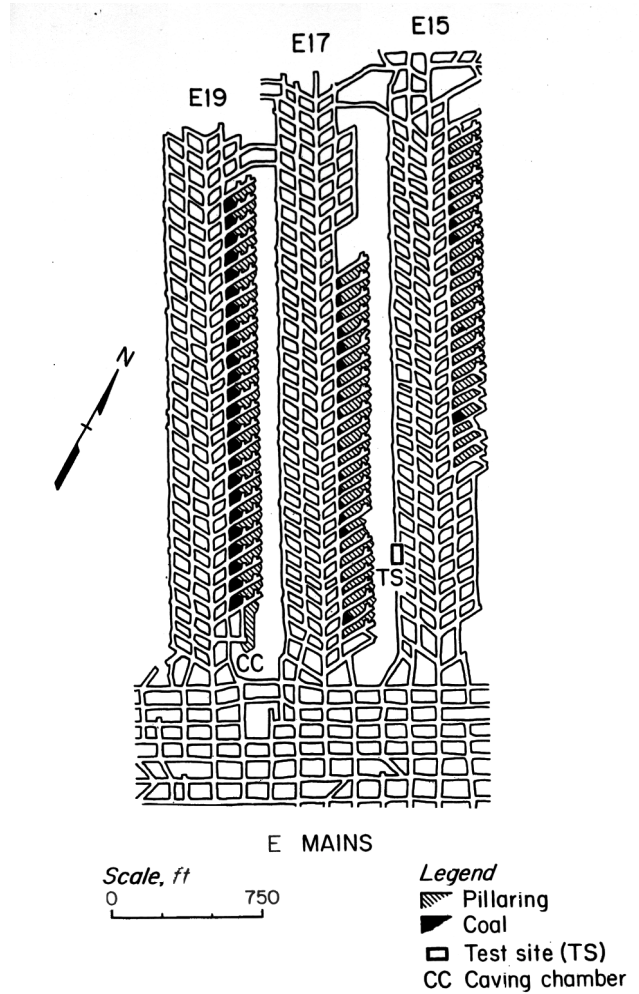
Plan view of panels E15, E17, and E19 showing location of test site
